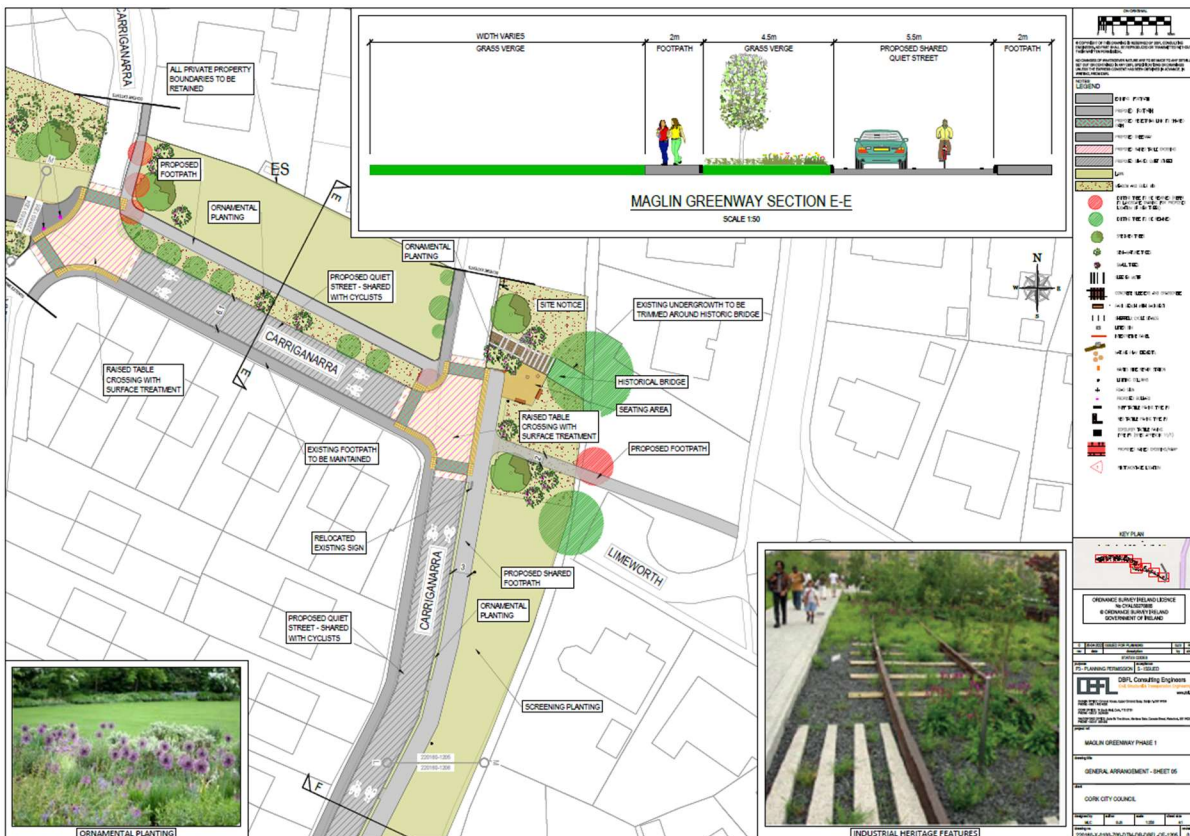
Proposed Route Detail 5 – Alignment between Carriganarra to the west and Limeworth estate to the east.
